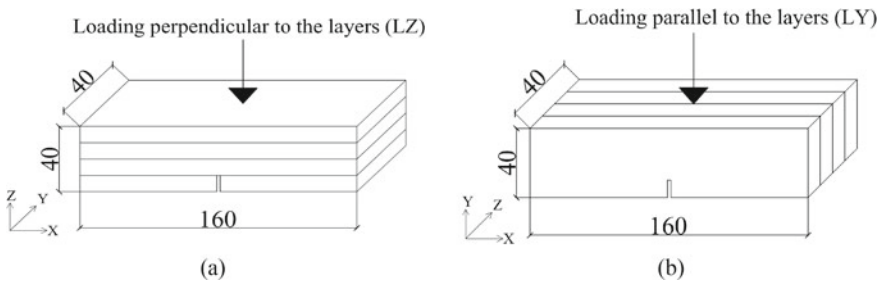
Schematic view of the cut and preparation of printed specimens from reference 3D printed prismatic elements for three-point bending test, a loading perpendicular and b loading parallel to the layers' orientation. Units: mm
